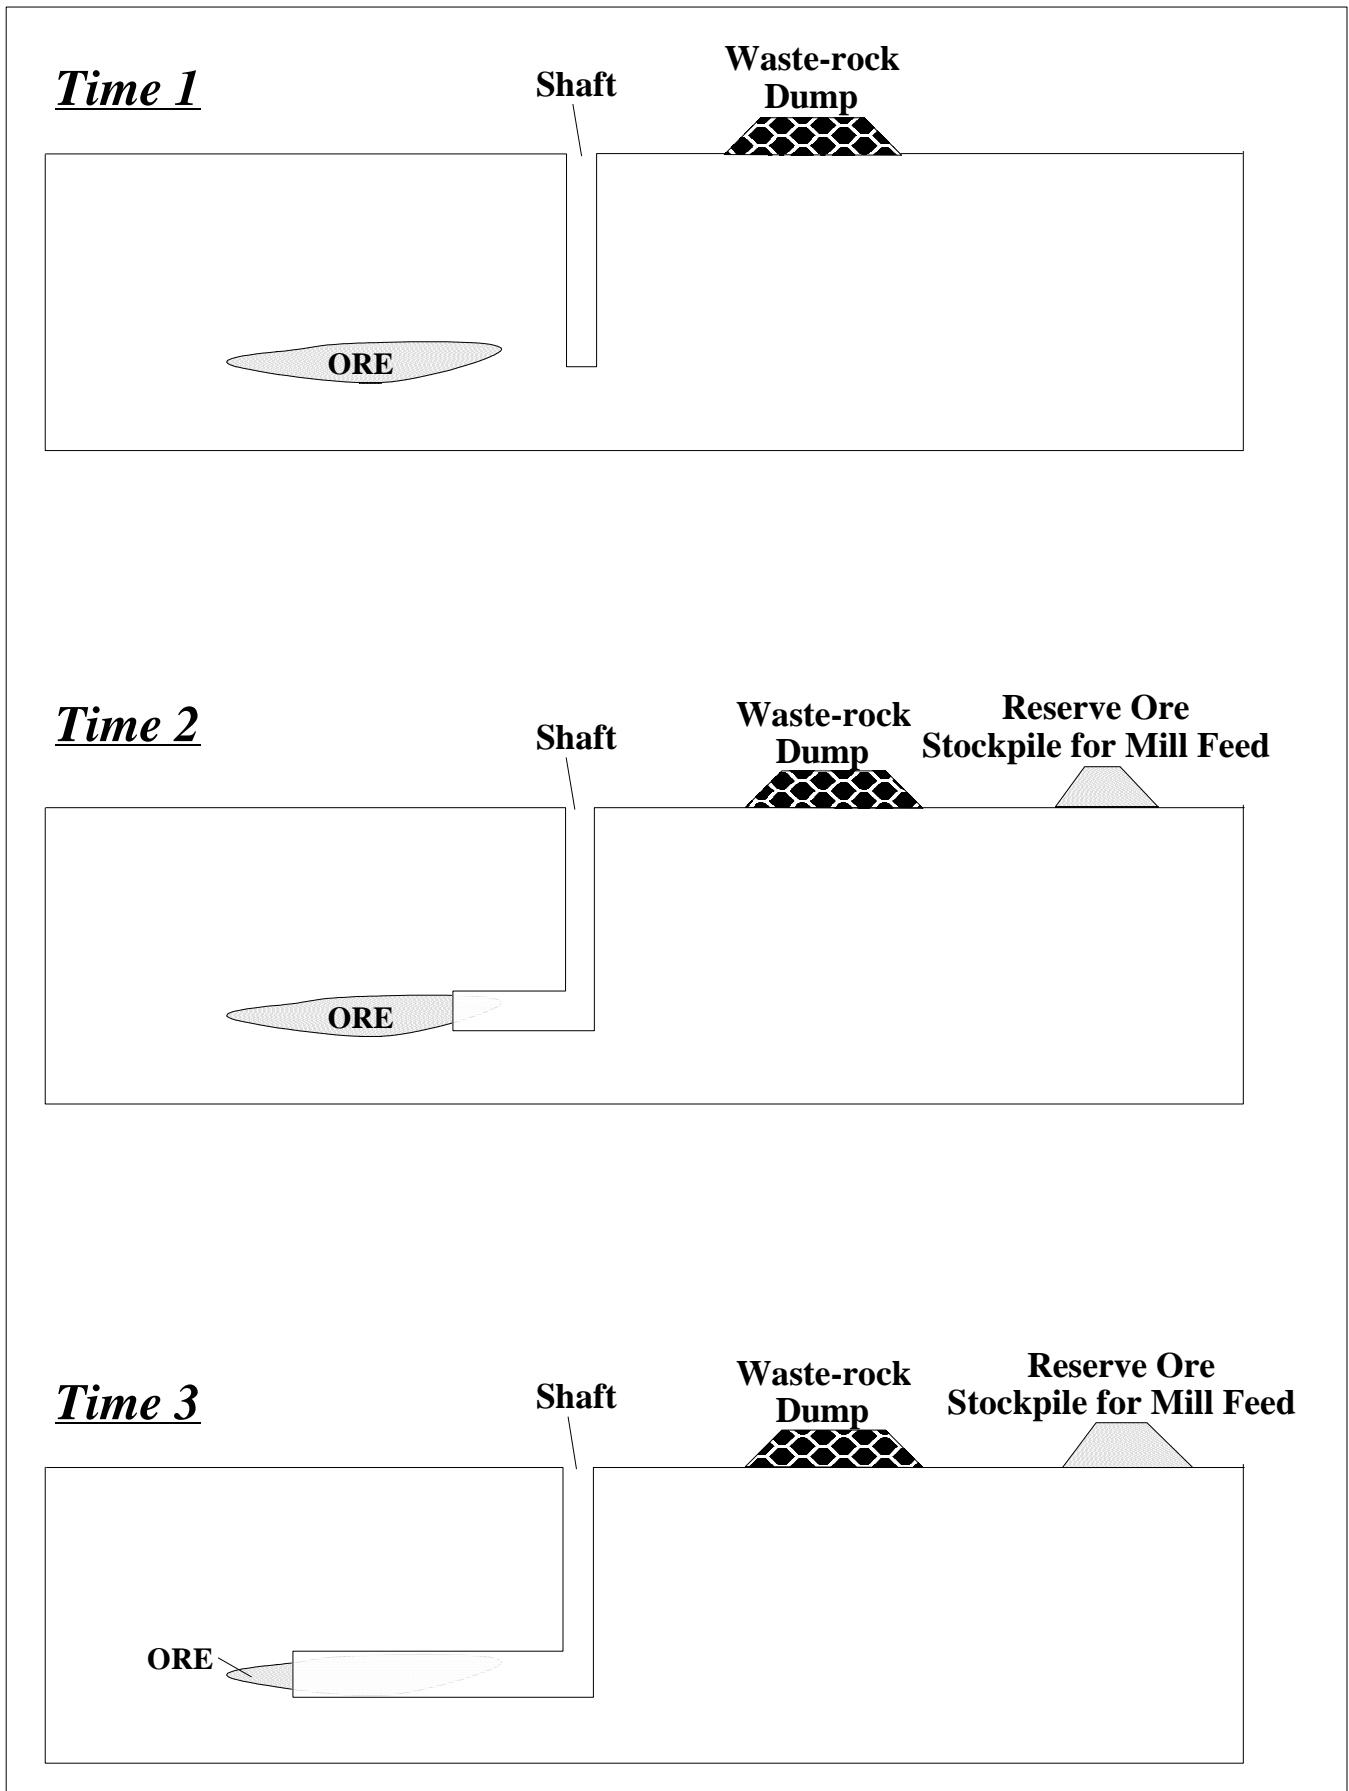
Schematic Underground Mining - Type 1.
